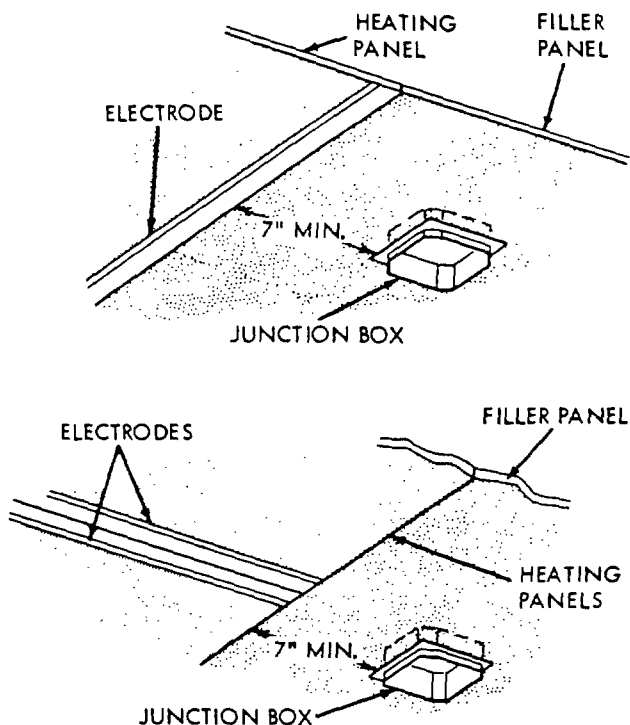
Light Fixture Junction Boxes Adjacent to Heating Panels
